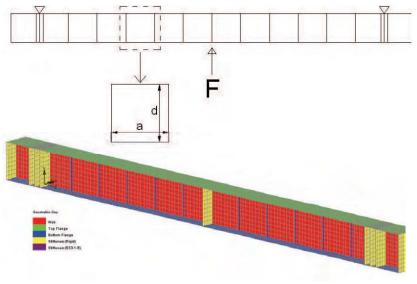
GIRDER LAYOUT USED IN FINITE ELEMENT MODELLING
